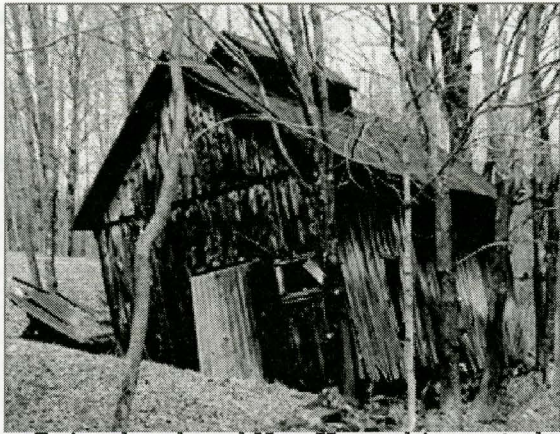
An abandoned New Hampshire sugarhouse. Note ridgeline ventilator, collapsed lean-to (for firewood storage), and exposed stone footings.
